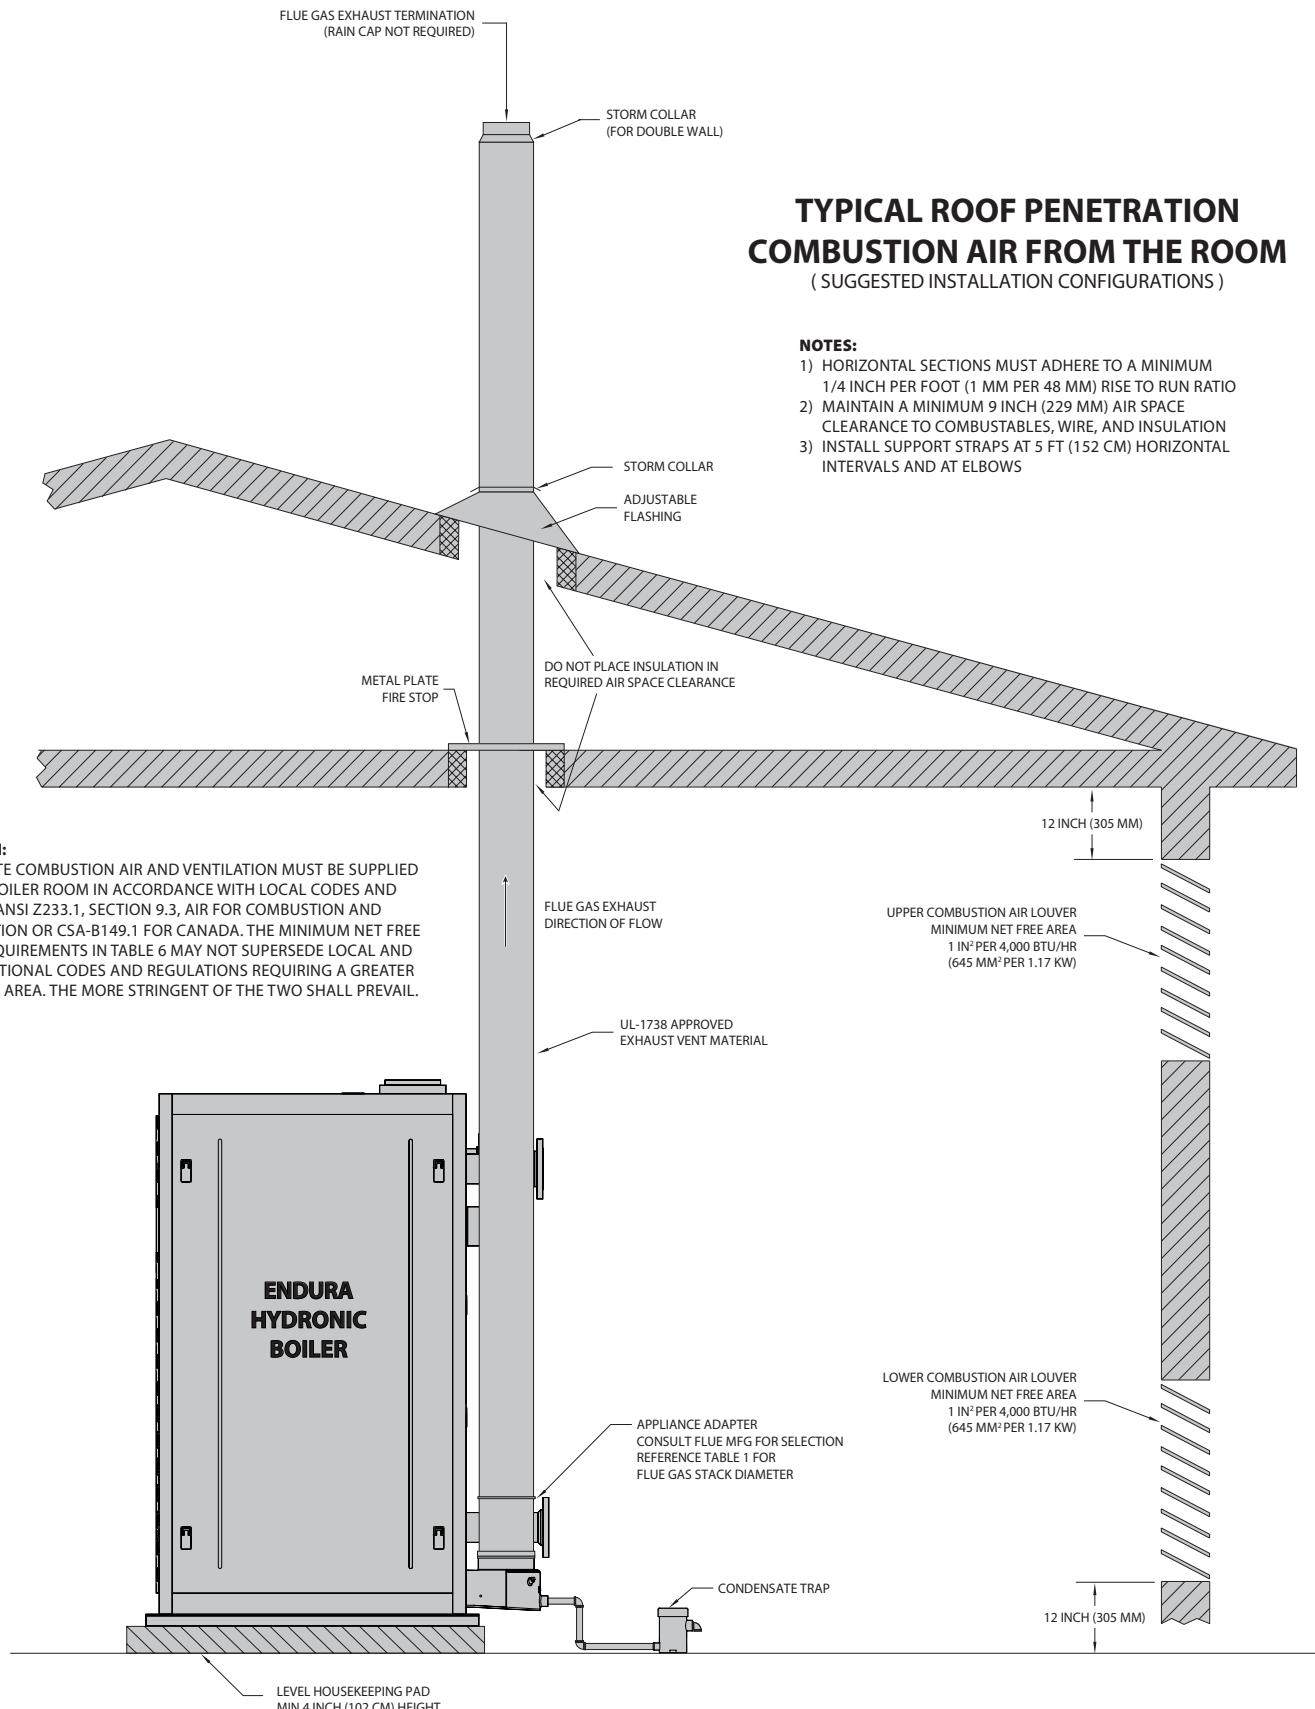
ROOF PENETRATION WITH COMBUSTION AIR LOUVERS DETAILS
